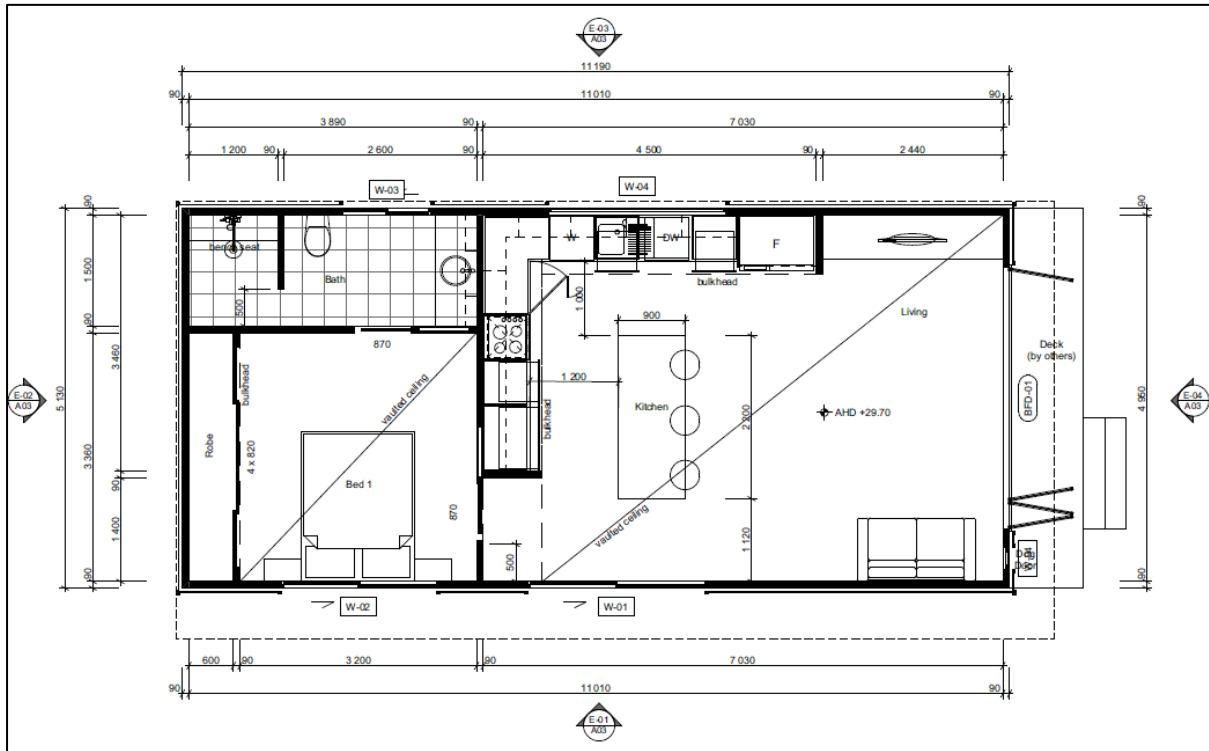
Floor Plan – Secondary Residence (Source: Spectura Studio).
